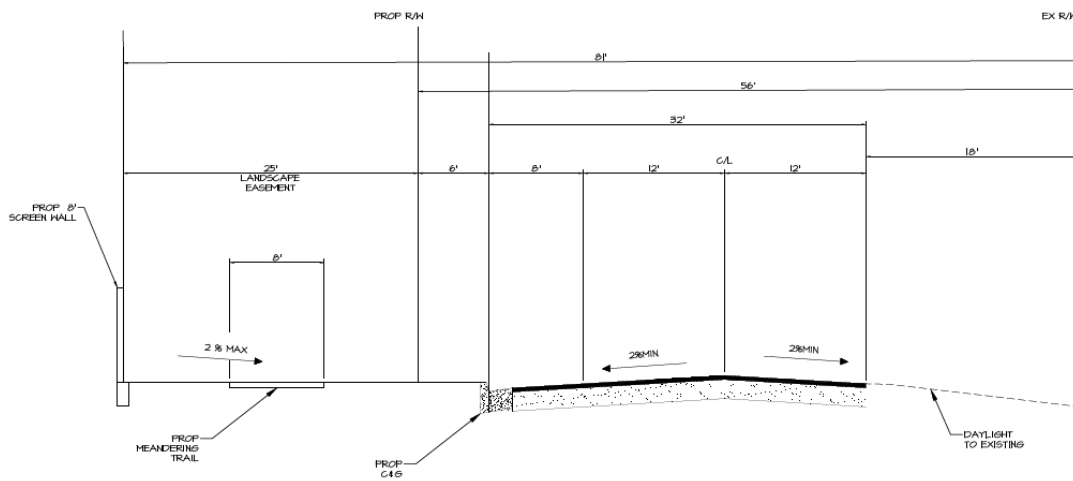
B Typical Beckwith Avenue Cross Section - Central
